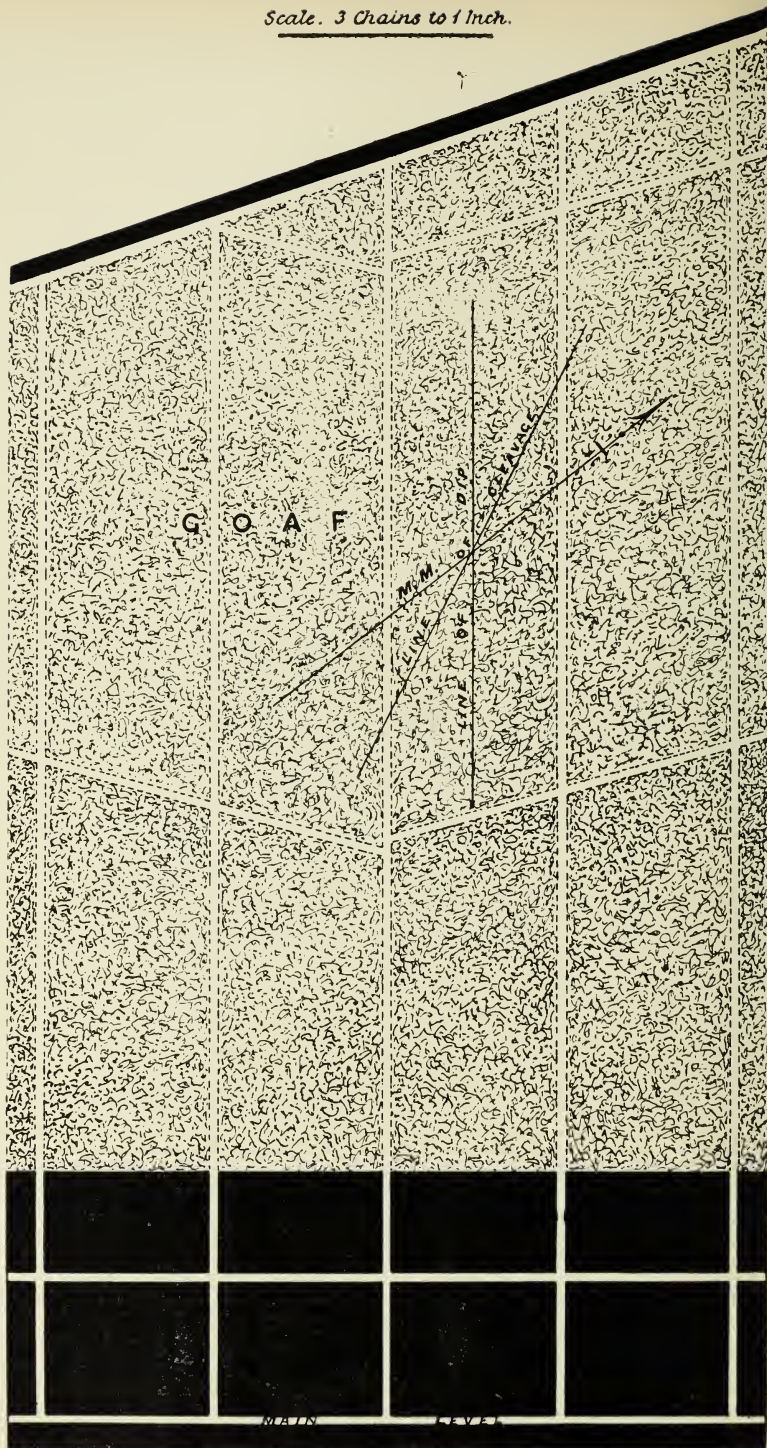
KIVETON PARK COLLIERY, NEAR SHEFFIELD. PLAN SHOWING LONGWALL METHOD OF WORKING THE BARNSELY SEAM.
